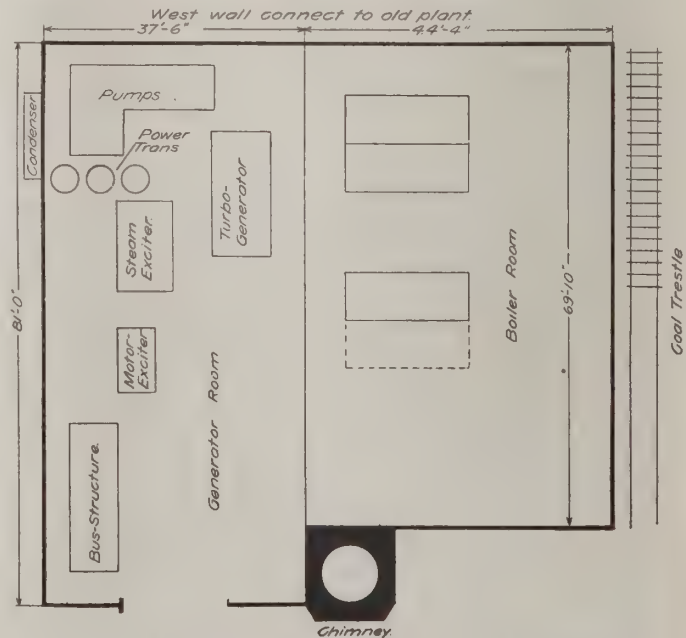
MAIN FLOOR ARRANGEMENT OF NEW AUGUSTA STATION (WEST PLANT).
